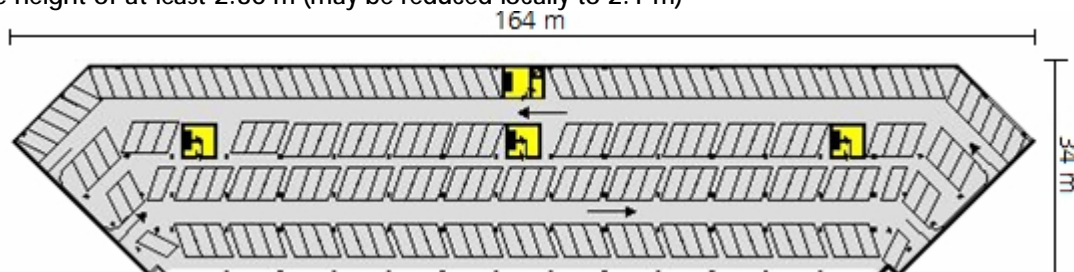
Functional plan for the -2<sup>nd</sup> floor
